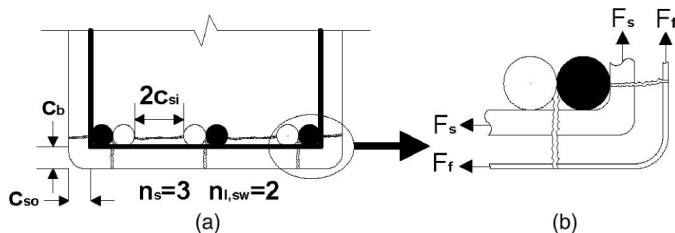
(a) Definition of c_b , c_{si} and c_{so} ; (b) forces induced by stirrups and TRM or FRP jackets against side- and face-splitting cracks
